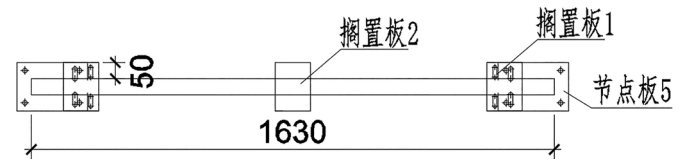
Short transom in a floor plan drawing (unit: mm)
